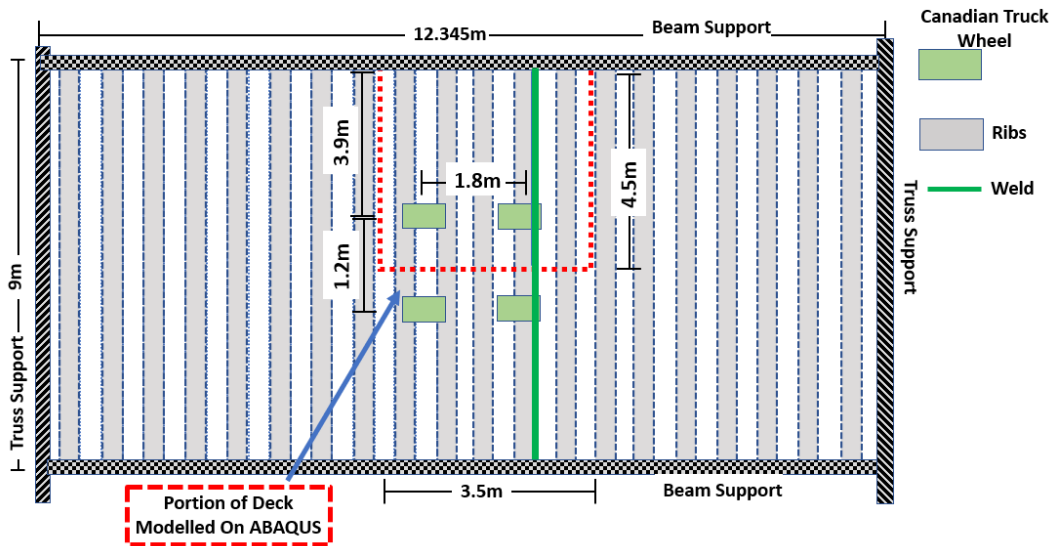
Top view of deck showing reduced geometry, weld location, and Canadian wheel truck locations.
